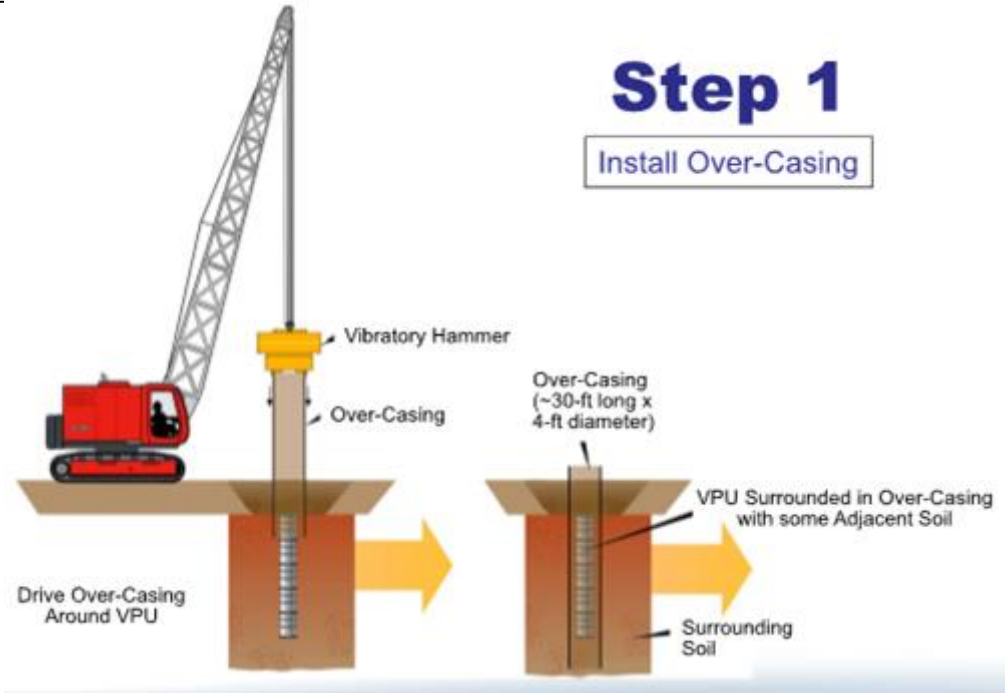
Installation of Over-Casing Around a Vertical Pipe Unit (Dunhan, 2012)
